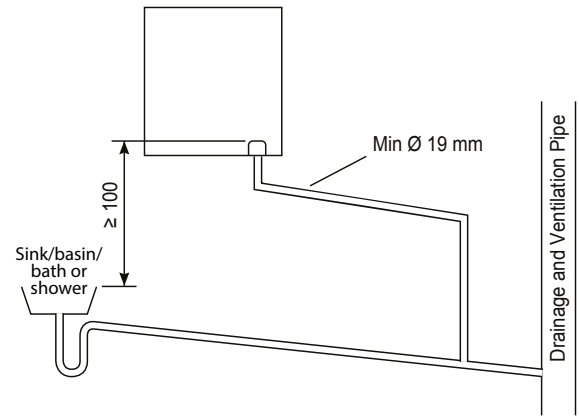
Connection of Condensate Water Drainage Pipe at Indoor Bathroom Drainage Lower Level
